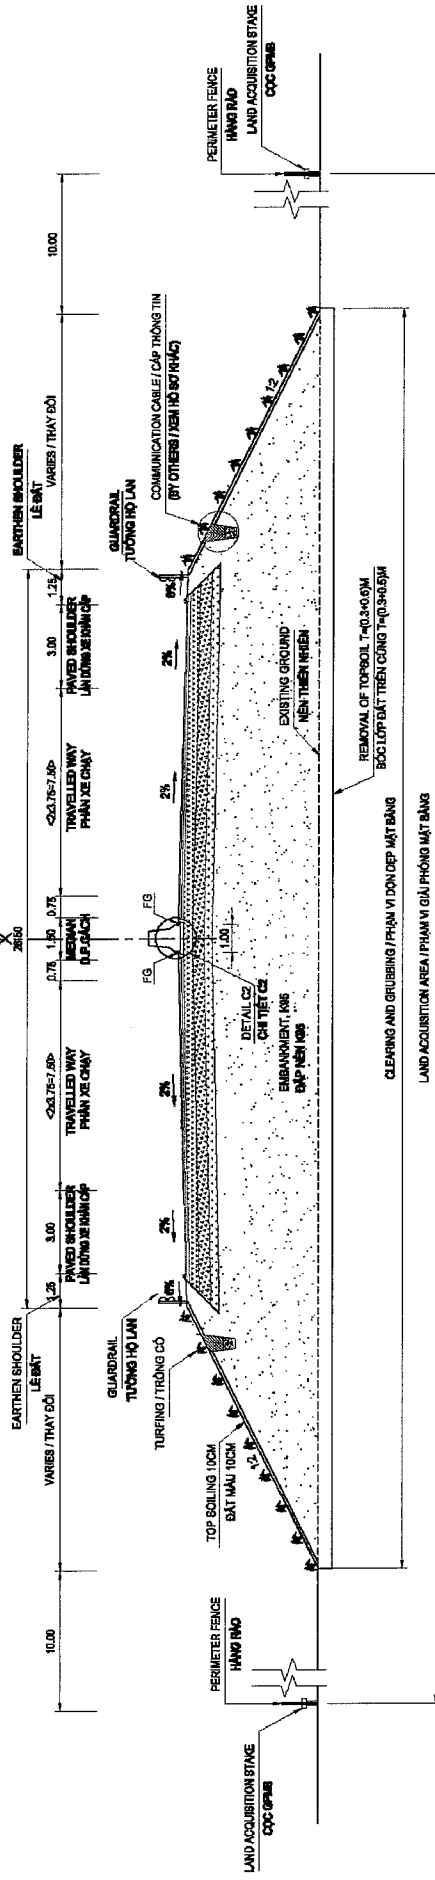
Typical Cross Section of Expressway at Bridge Approach
